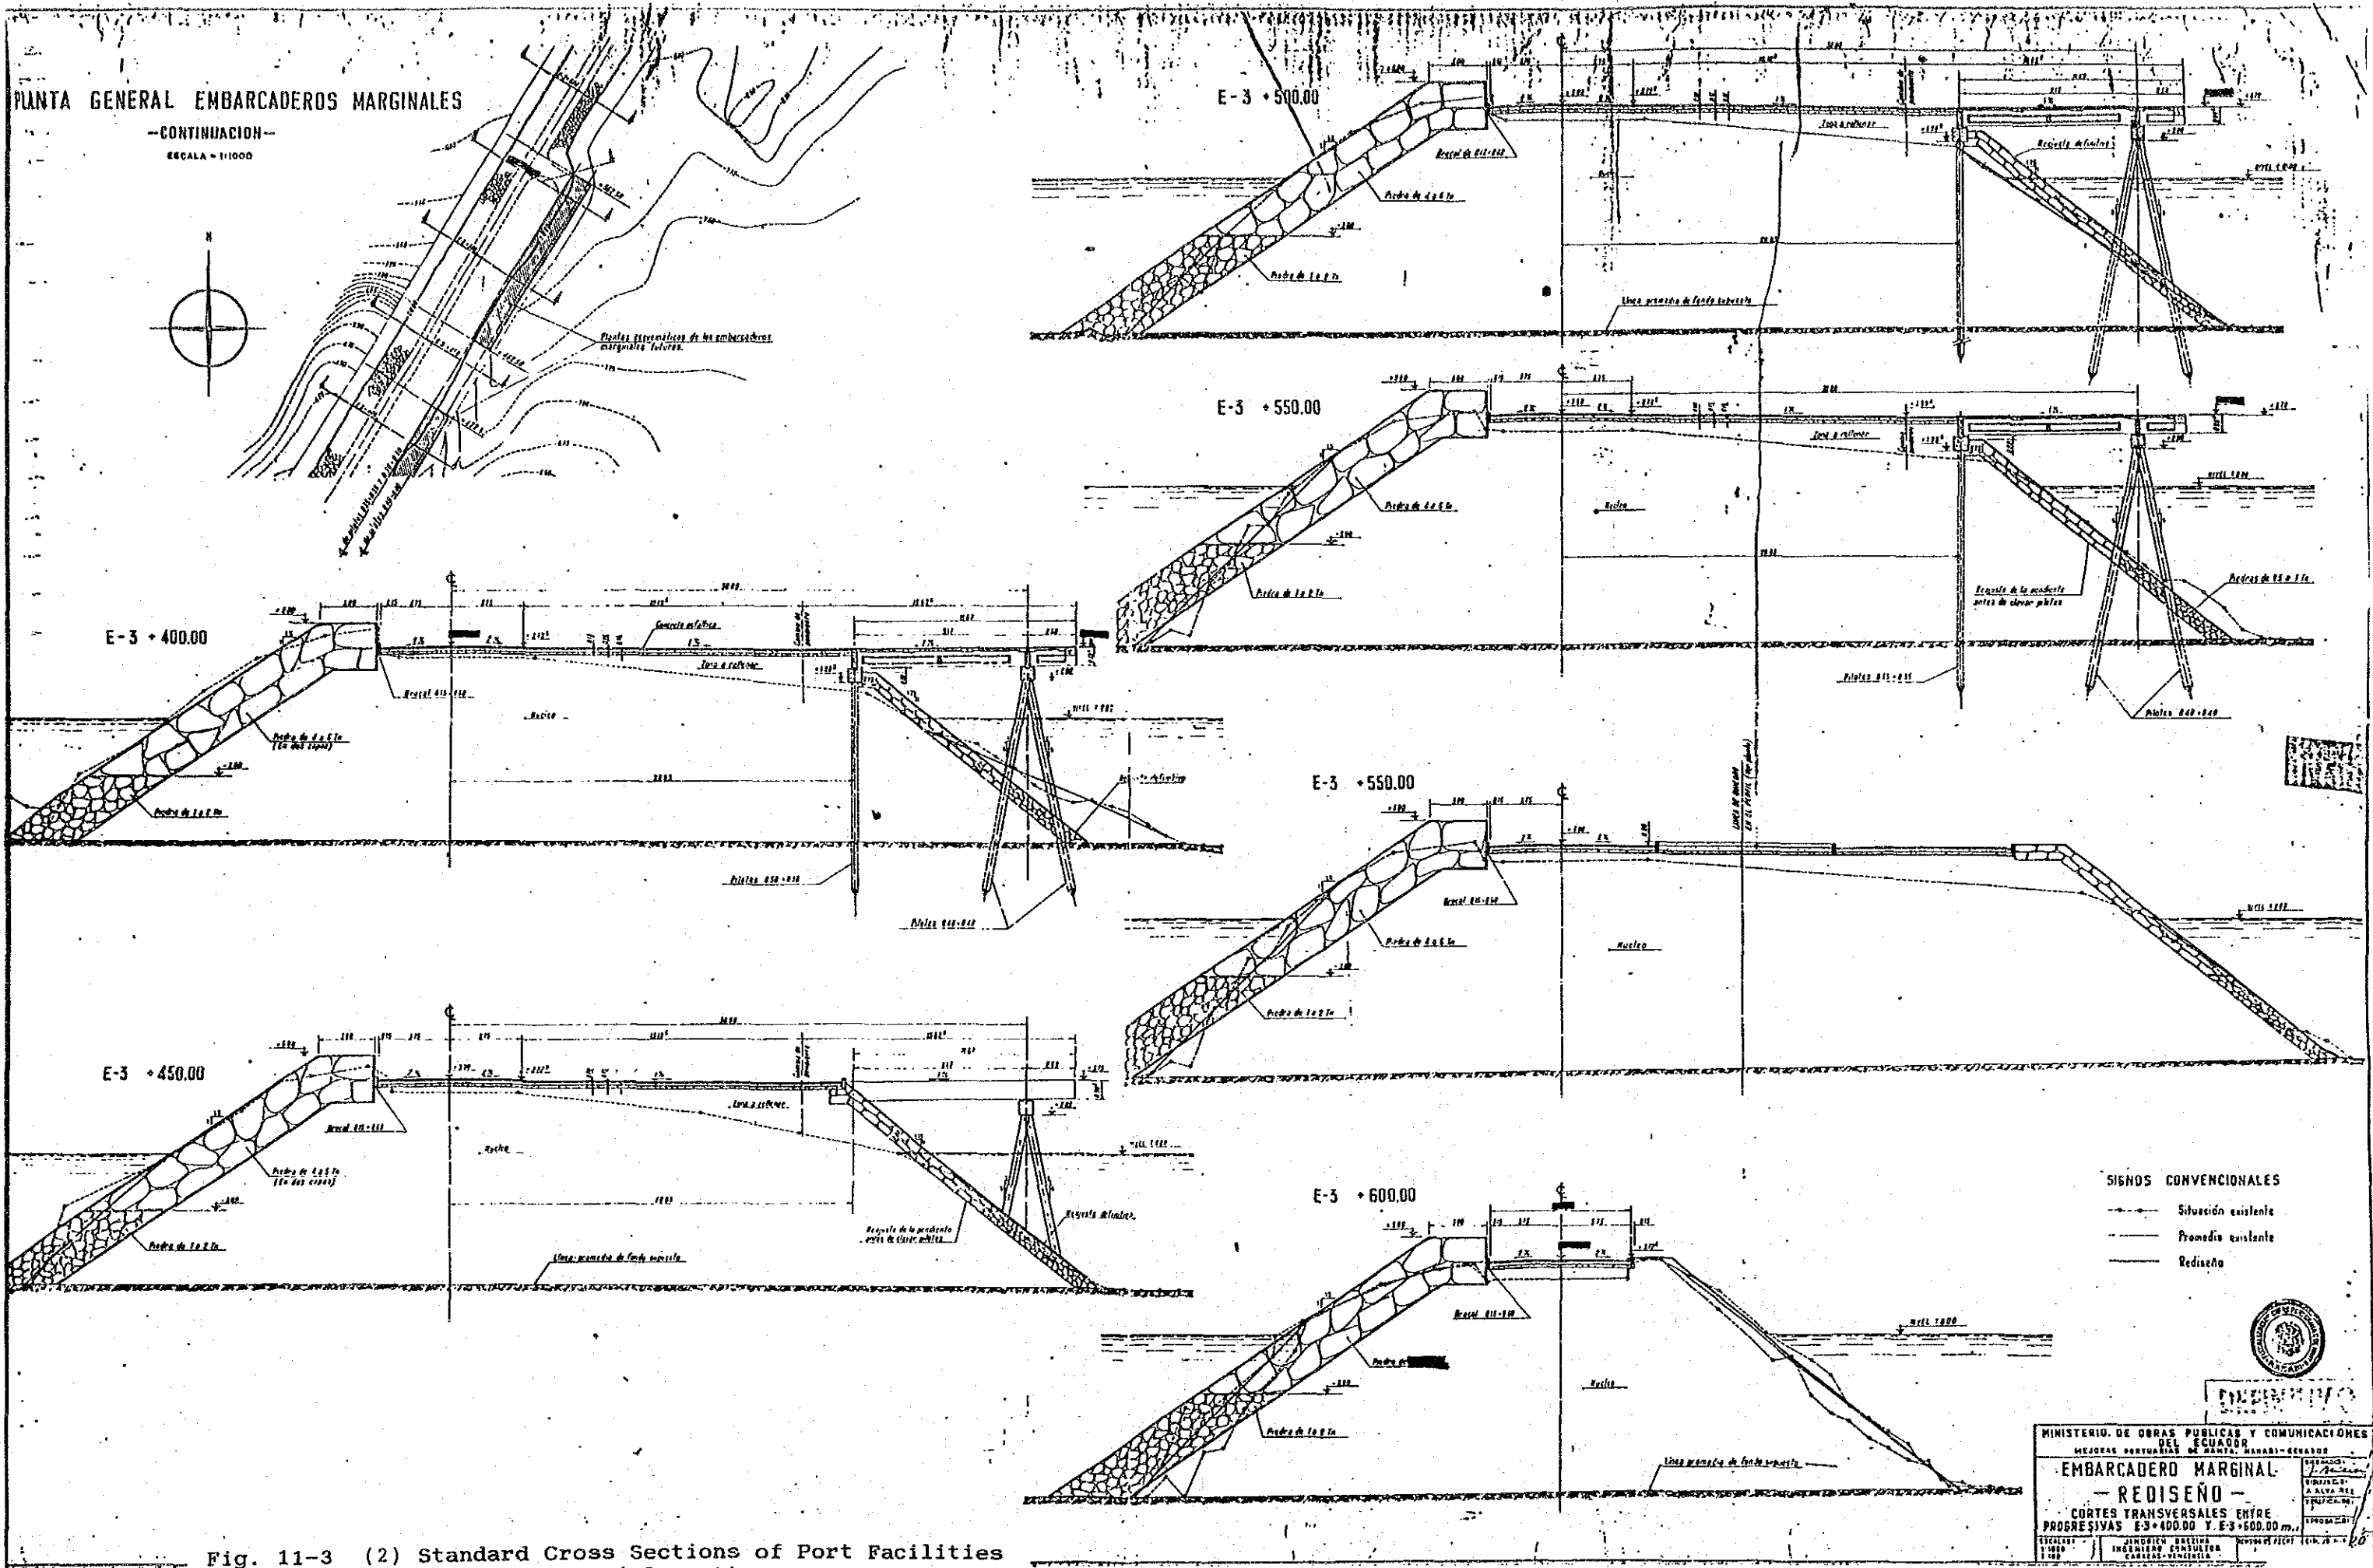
(2) Standard Cross Sections of Port Facilities (Manta Commercial Port)
